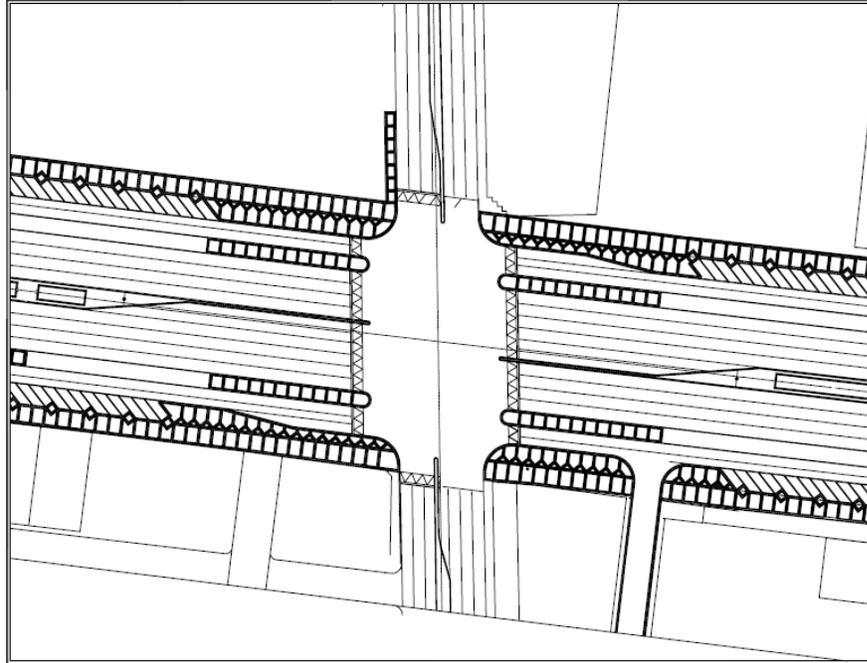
Intersection 2 (Node2) King Abdullah Road–Riyadh Street (Olba, 2007)
